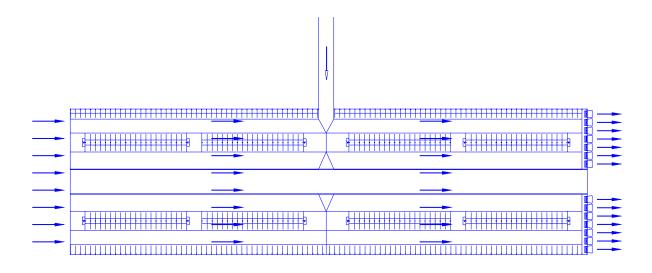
Plan view of a typical tunnel-ventilated freestall barn.
